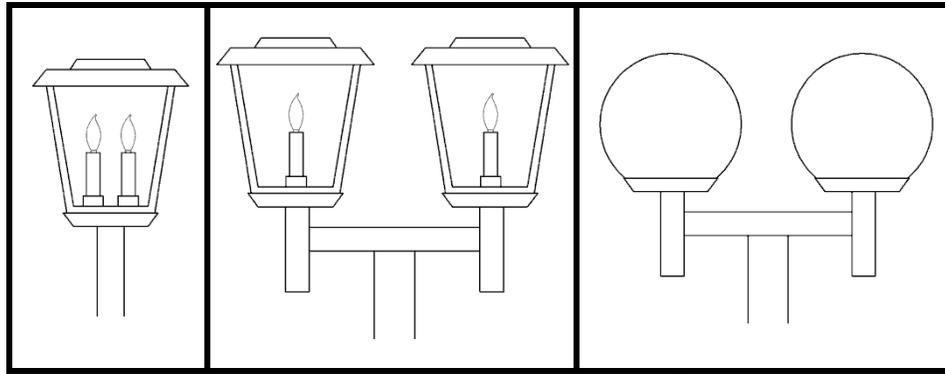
Light fixtures* with multiple lamps in a single fixture (left) and on a single pole (center, right)
